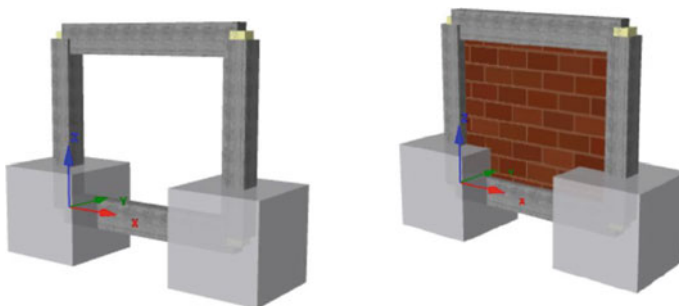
3D modeling of the open frame (left)—infilled frame (right)
